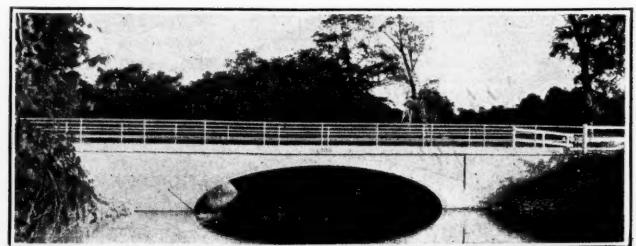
CONCRETE ARCH ON A MASSACHUSETTS STATE HIGHWAY.
